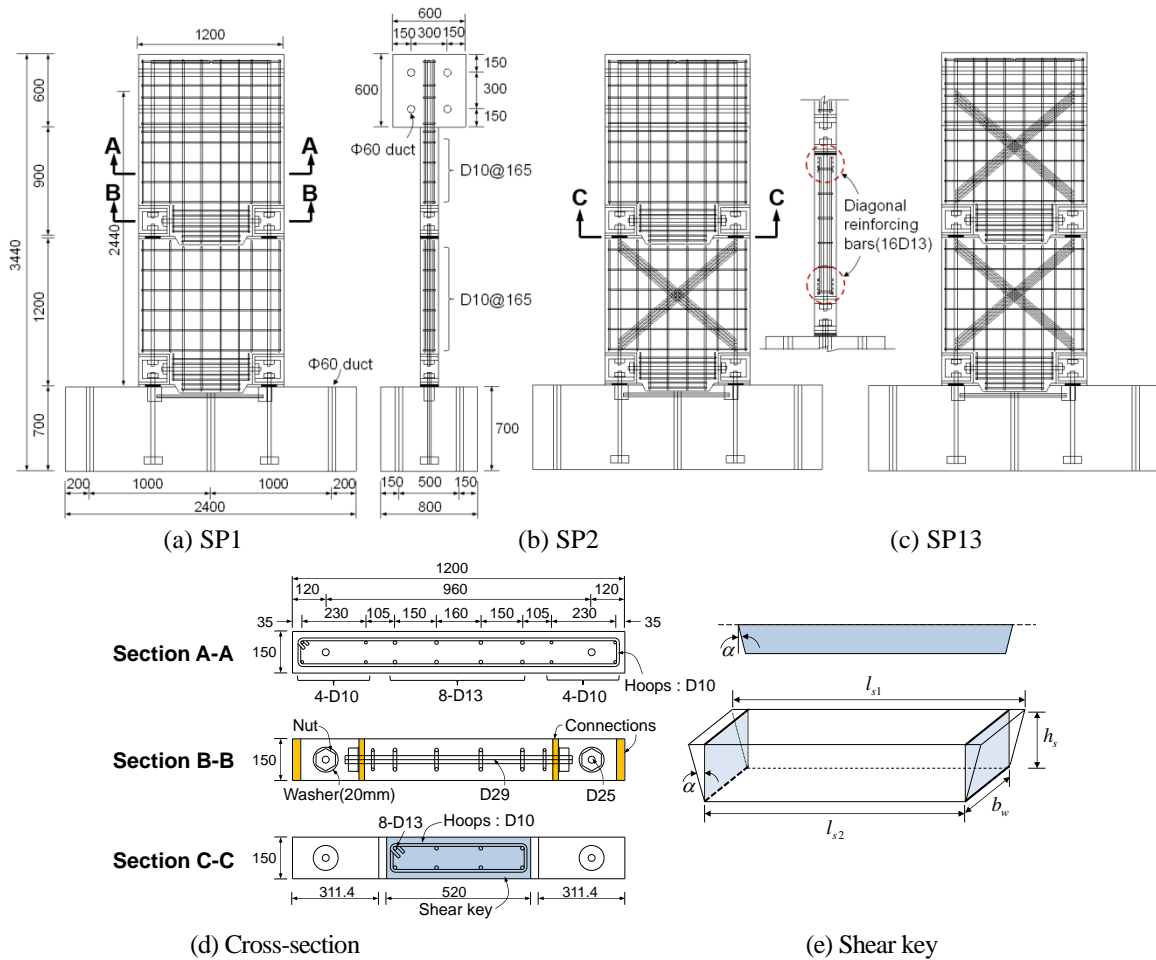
Details of test specimens (Note: Dimensions in mm, 1 mm = 0.0394 in.)
